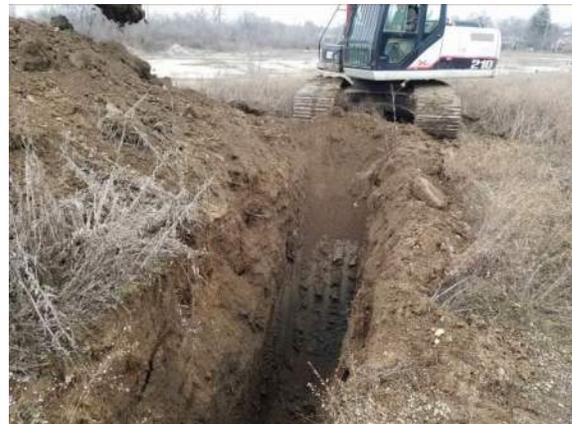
Further example view of test pitting of stockpiled soils (1/6/2021).
